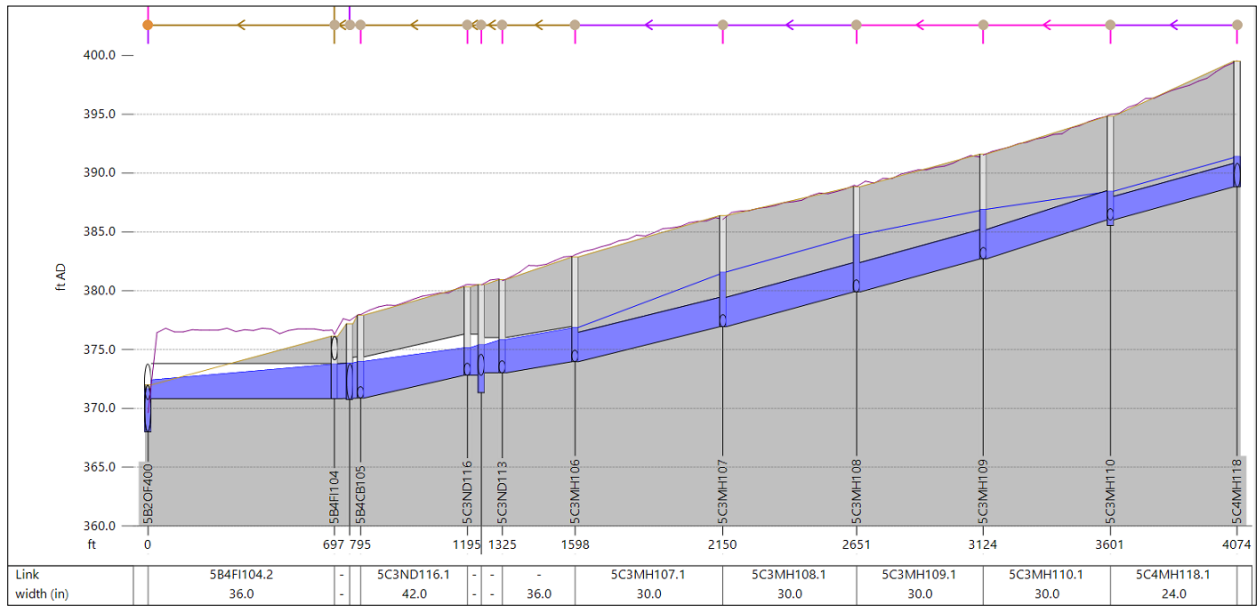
Profile of Jack London Boulevard storm showing 100-yr HGL
